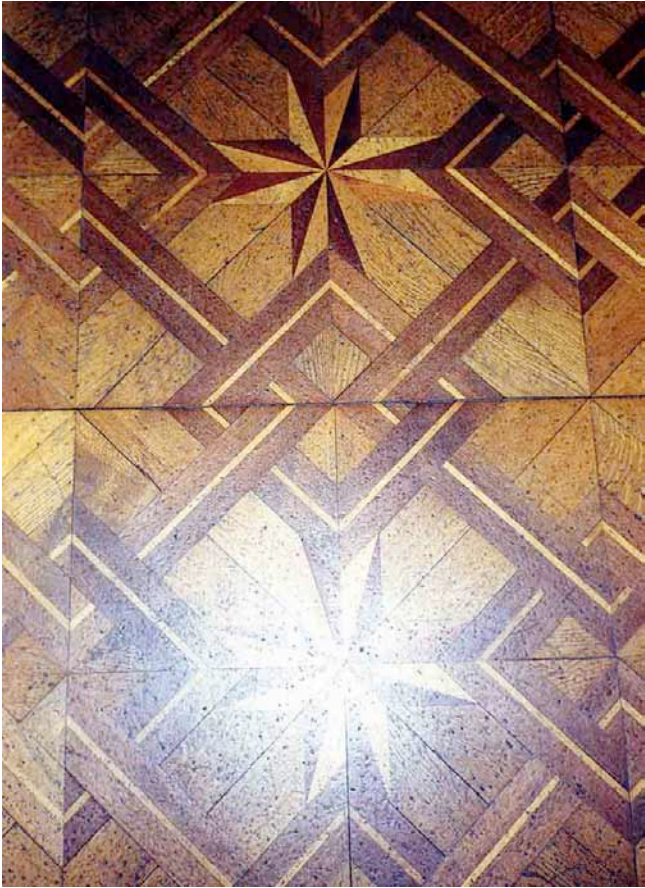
Detail of the parquetry floor in entrance hall
